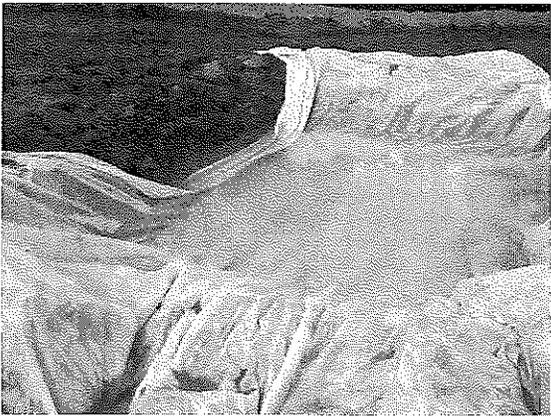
Concrete washout liner not stabilized and high pH water in contact with bare soil at Sta. 1107+50
